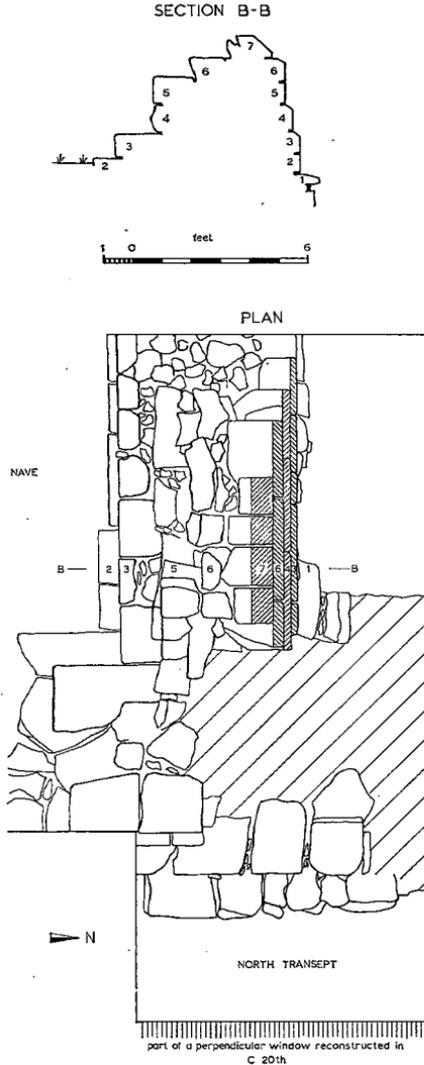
JUNCTION OF NORTH WALL OF NAVE WITH WEST WALL OF NORTH TRANSEPT (7)
